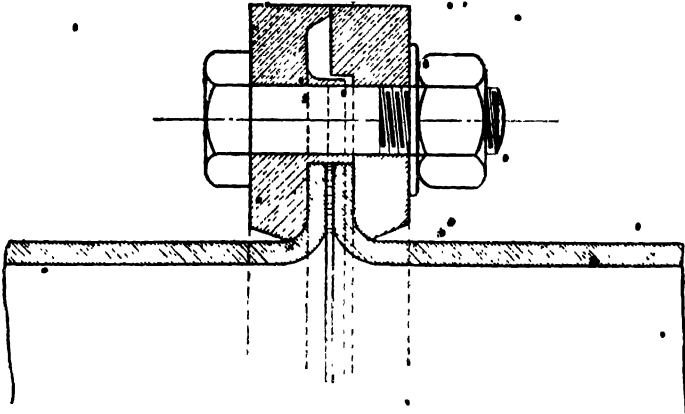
Type of Circumferential Joint for Welded Steel Pipe
